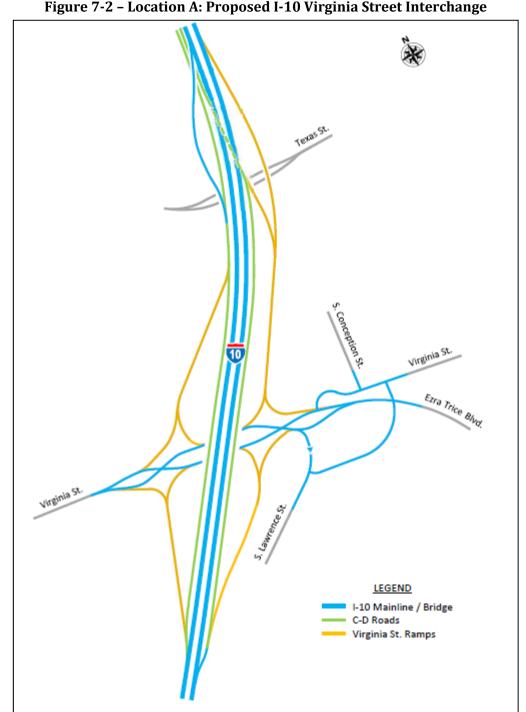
Location A: Proposed I-10 Virginia Street Interchange
